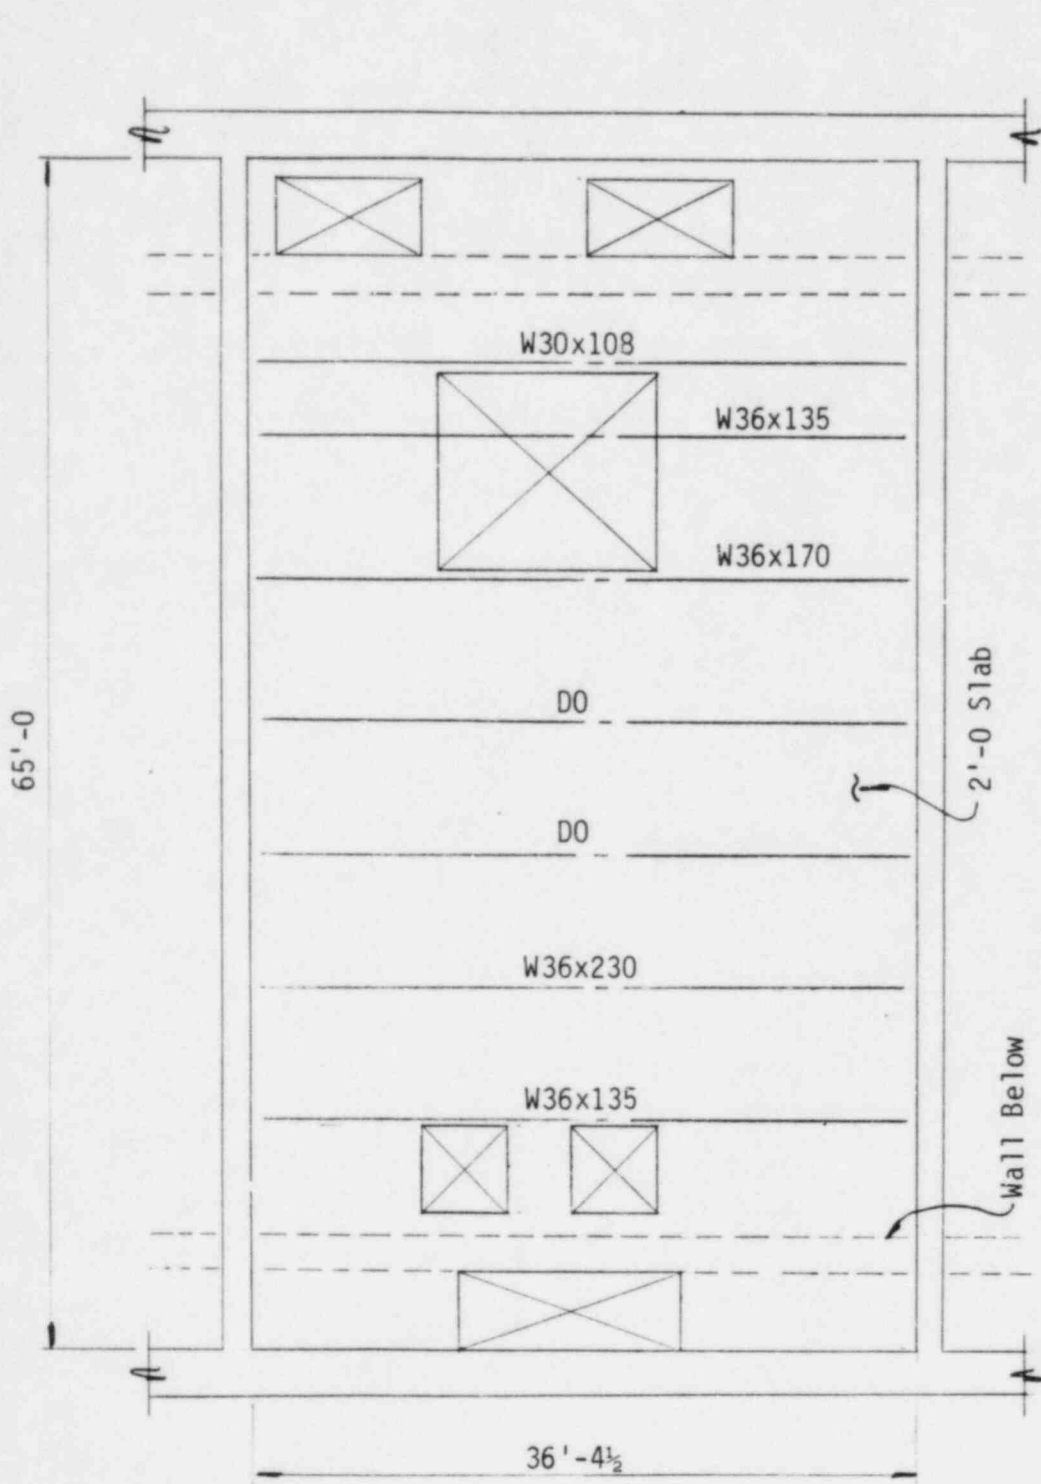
SERVICE WATER PUMP STRUCTURE FLOOR
